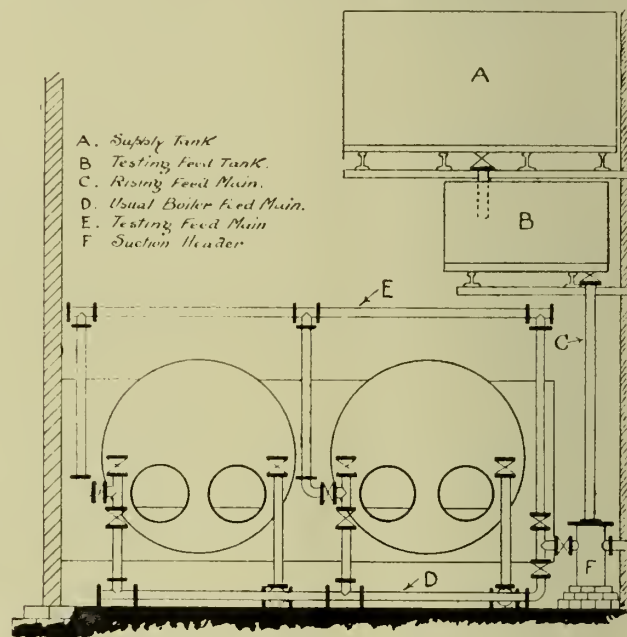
LAY OUT OF TANKS, CONNECTIONS, AND VALVES FOR TESTING.
